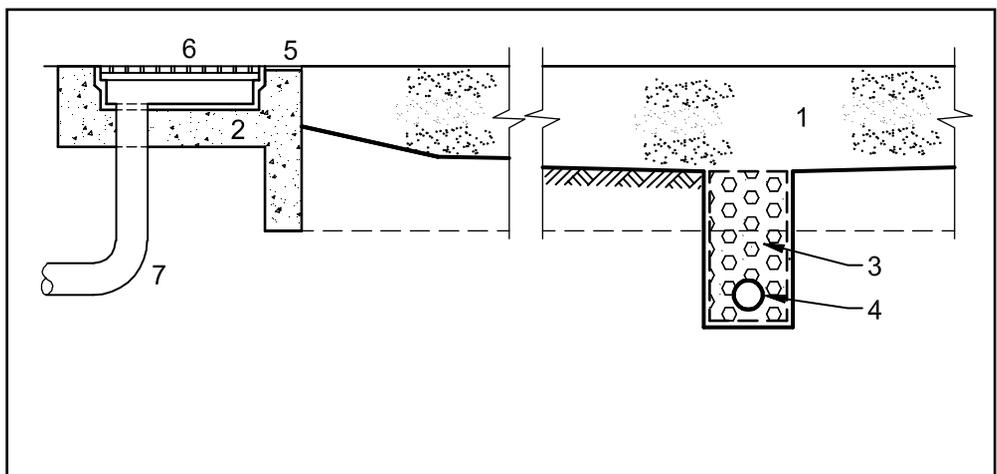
Draining long and triple jump pits and adjacent sand scraping grid Cross Section
